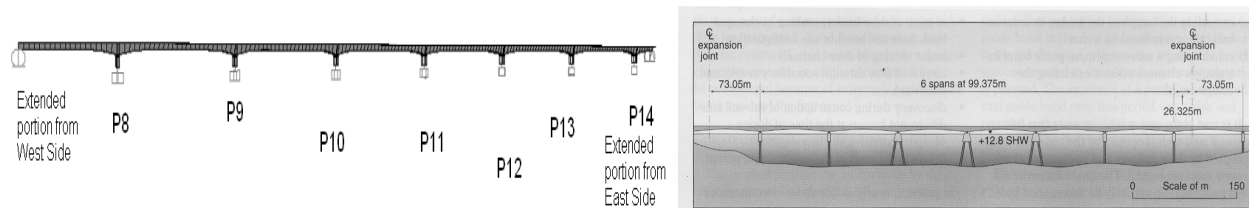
(a) Longitudinal profile of the model, (b) Pile arrangement.
